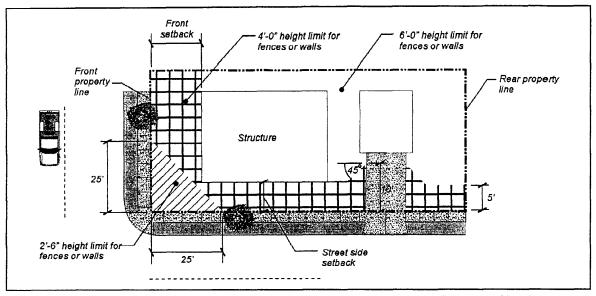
Corner wall and fence height limits in the RS and RM-12 zoning districts
